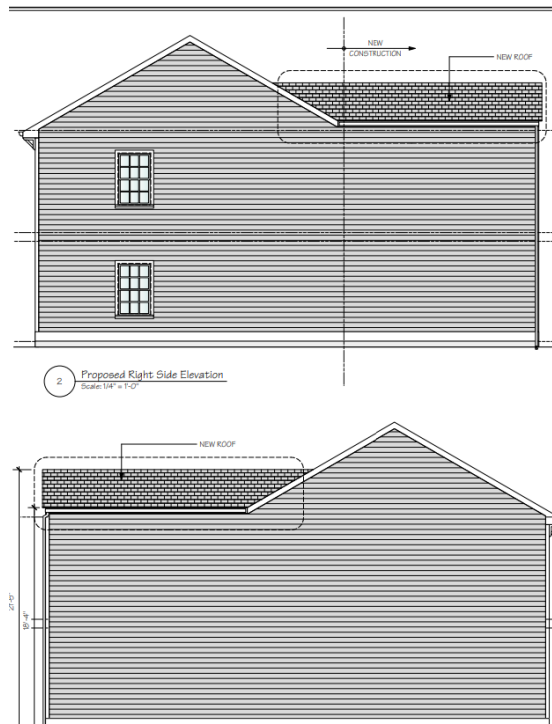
Proposed east elevation (top) and west elevation (bottom)
